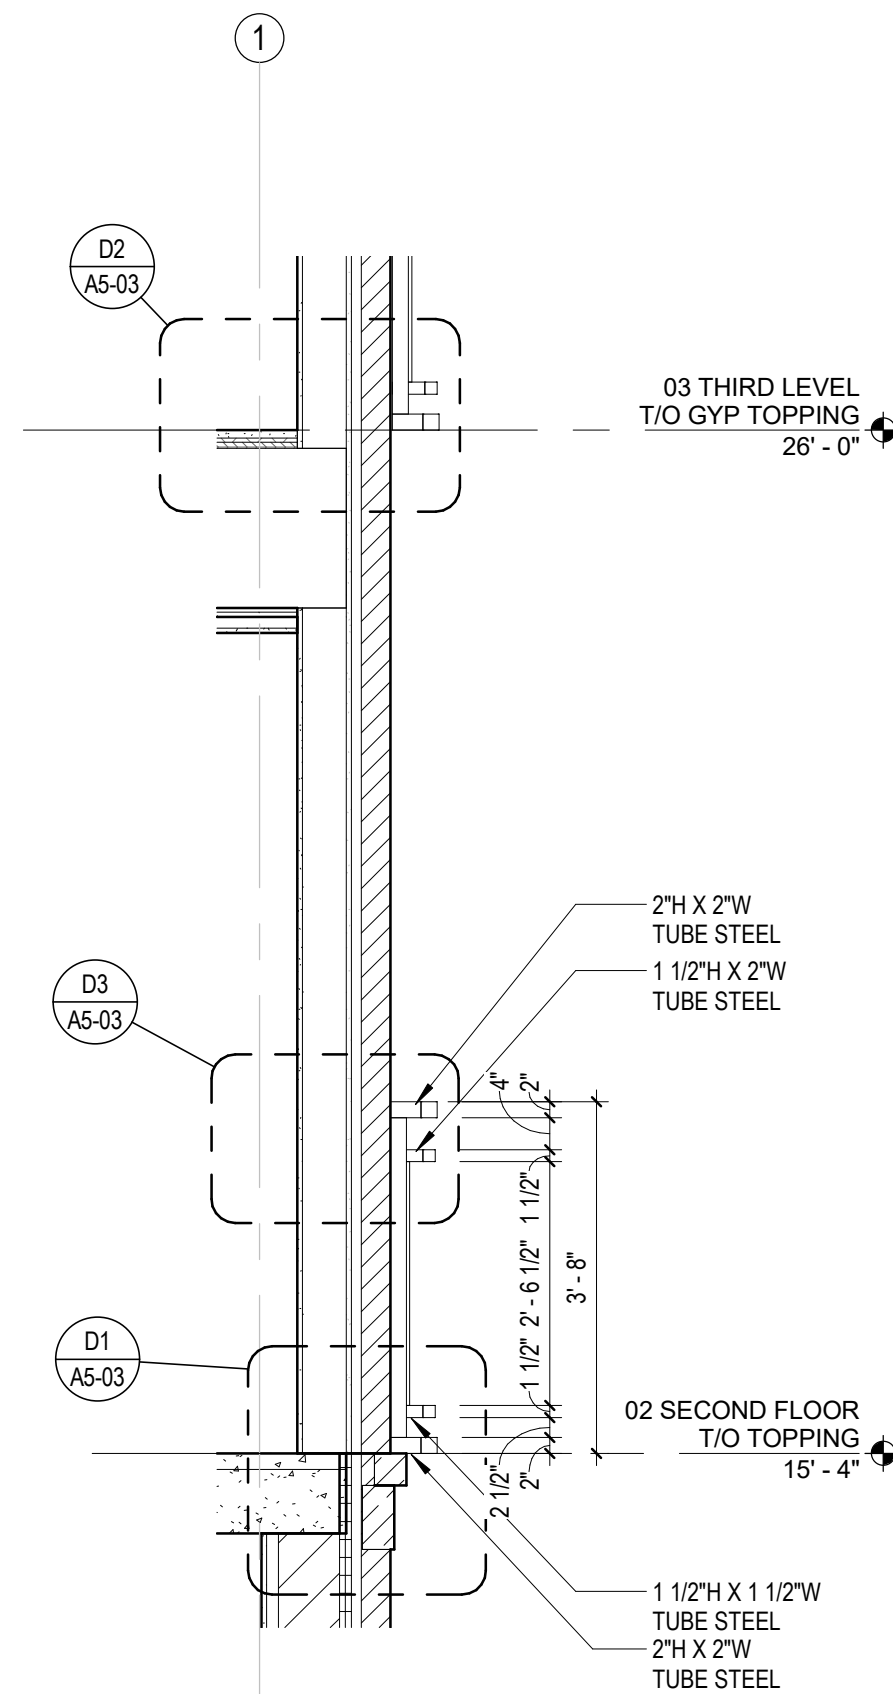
DETAIL- JULIETTE BALCONY CONNECTION AT WOD FRAMING 2
